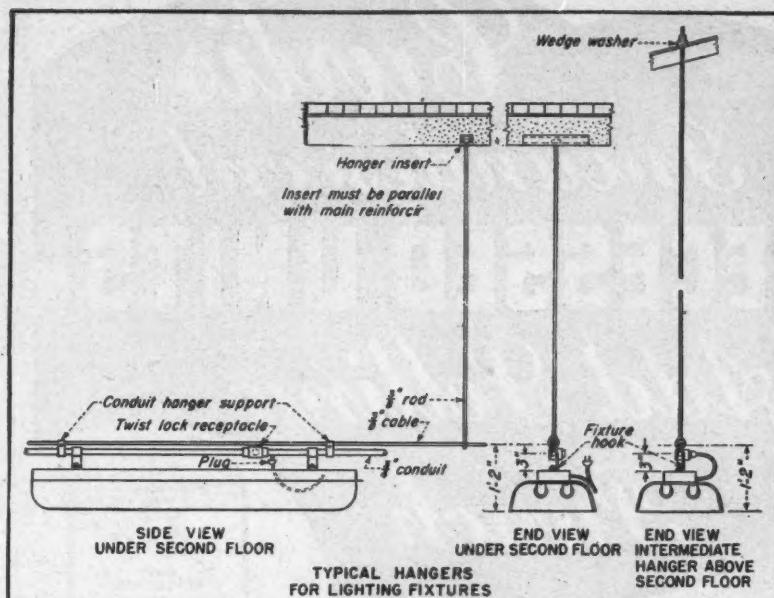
Typical hanger designs for suspending messenger cable and fluorescent fixtures at the new Chevrolet Flint Assembly Plant. Note quick-maintenance feature of fixture suspension.
